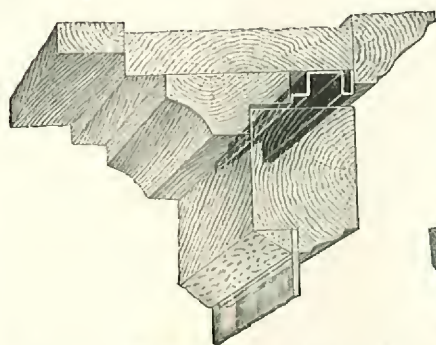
Cross-section thru sash and window frame at top showing installation of "AiR-Way" track above sash and tight application of sash.
